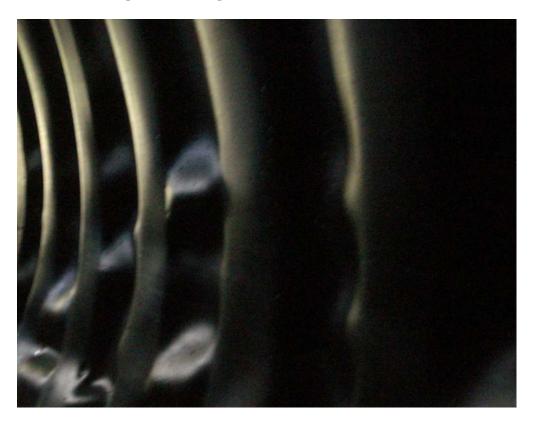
Rippling Discovered along Pipe Sidewalls
